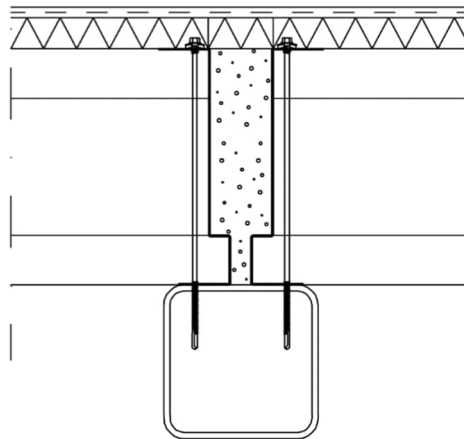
Connections between long span composite panel and primary structure [31]
